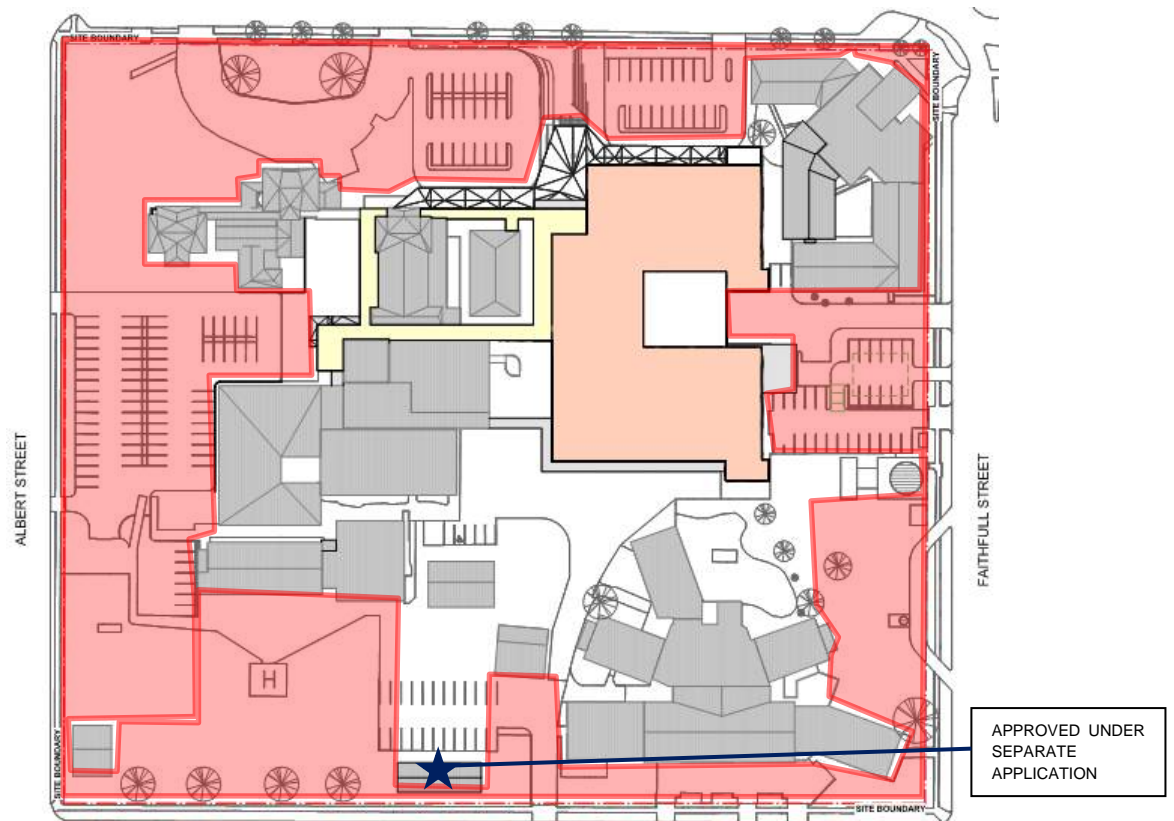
Extract of proposed site plan with approximate setback zones marked in red.
